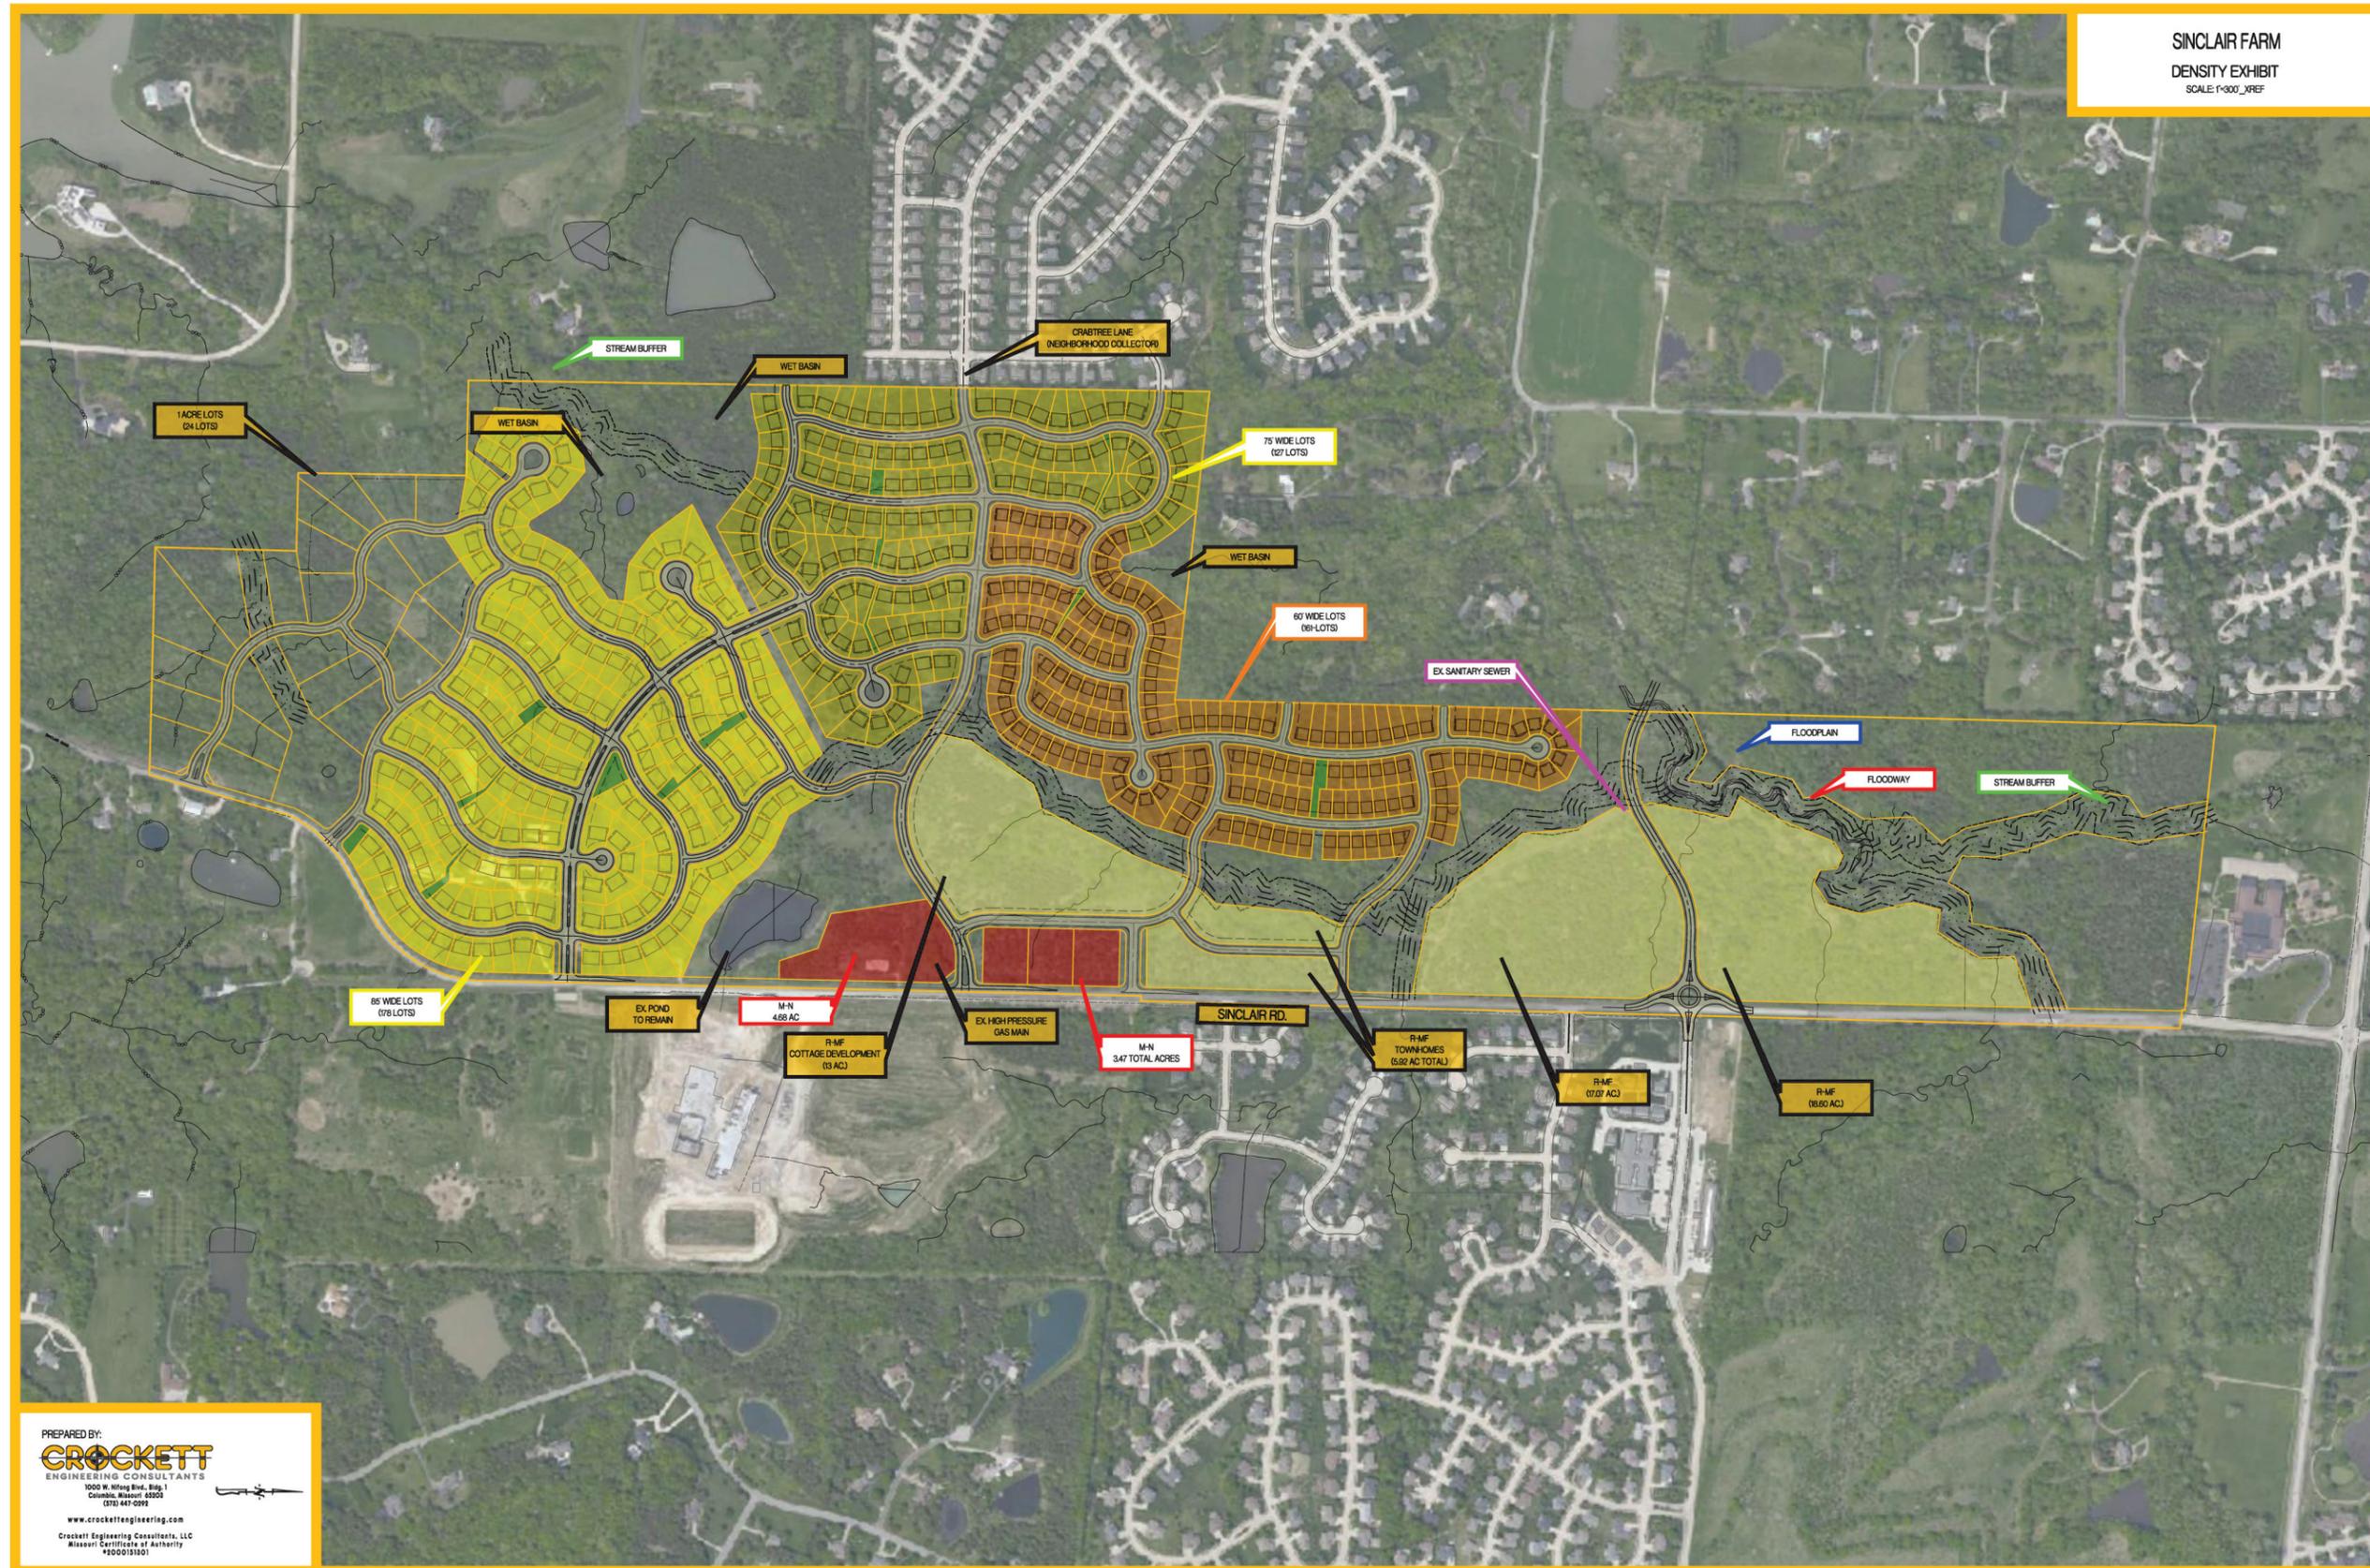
A: Updated Preliminary Site Plan (provided by others)
